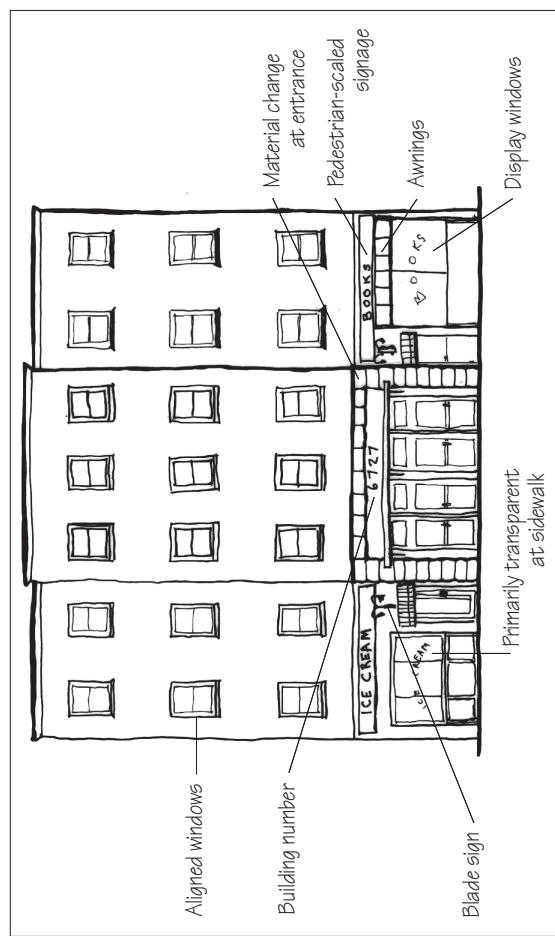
Appropriate structure, architectural detailing, and signage improve the attractiveness of sidewalks and streets.
